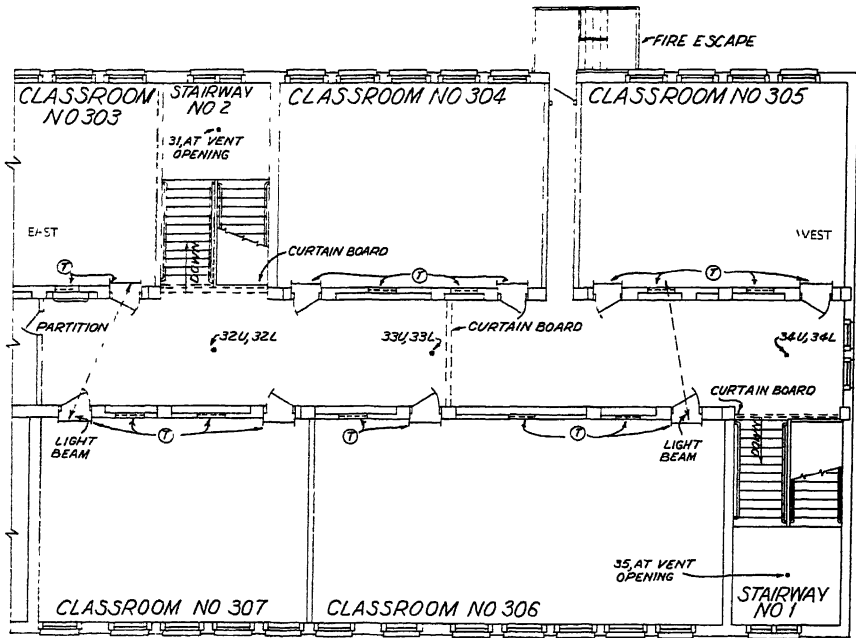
Cont. Floor plan of third floor showing location of thermocouples, curtain boards and light beams from photoelectric cells.
